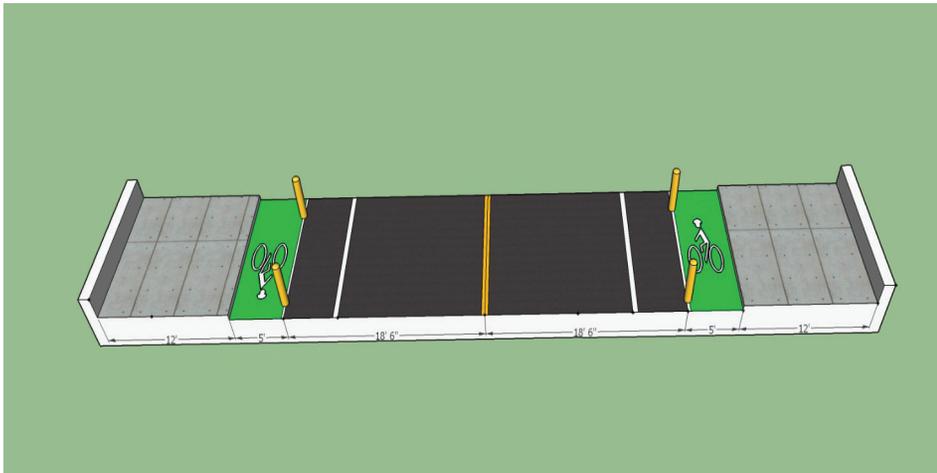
Current design of Cherokee Avenue bridge over I-20 in Grant Park, looking north
